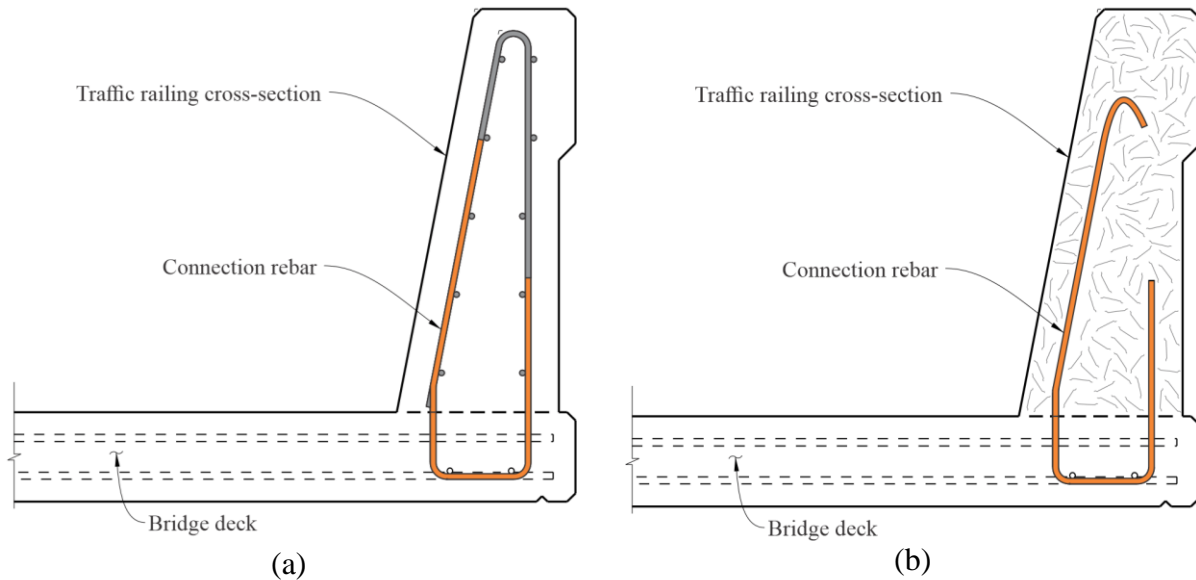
Florida DOT traffic railing: (a) Current reinforcement design (after FDOT, 2020a);
